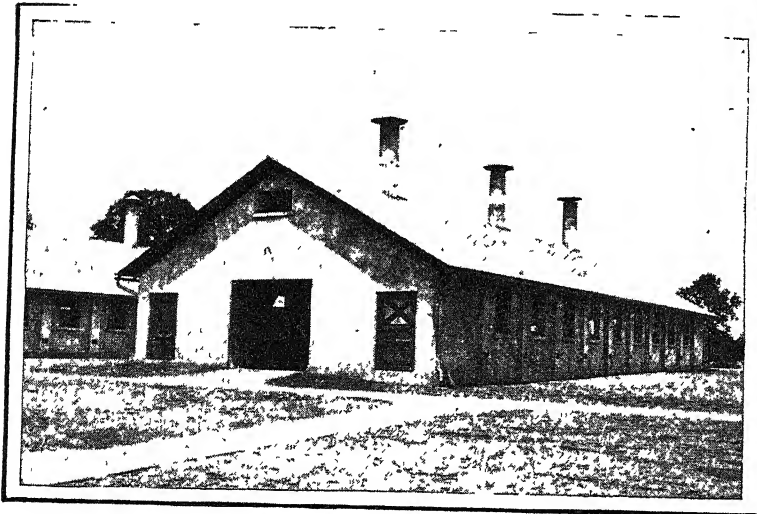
Cows are Housed in Hollow-Tile Stables, with Concrete Floors and Plenty of Light and Air.
